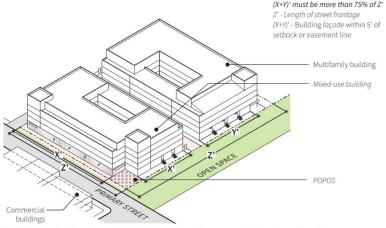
Place buildings along public rights-of-way and public open spaces to frame the public realm.
